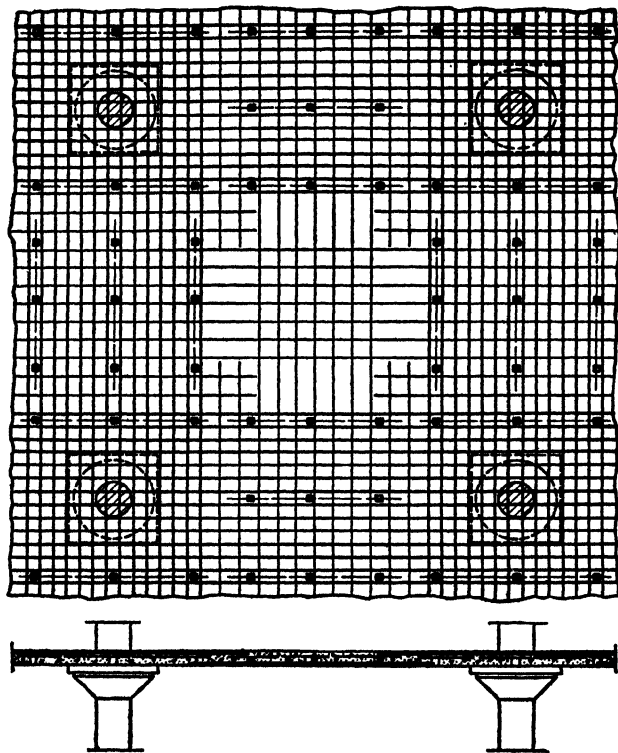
Two-Way Flat Slab System. (See p. 542.)
